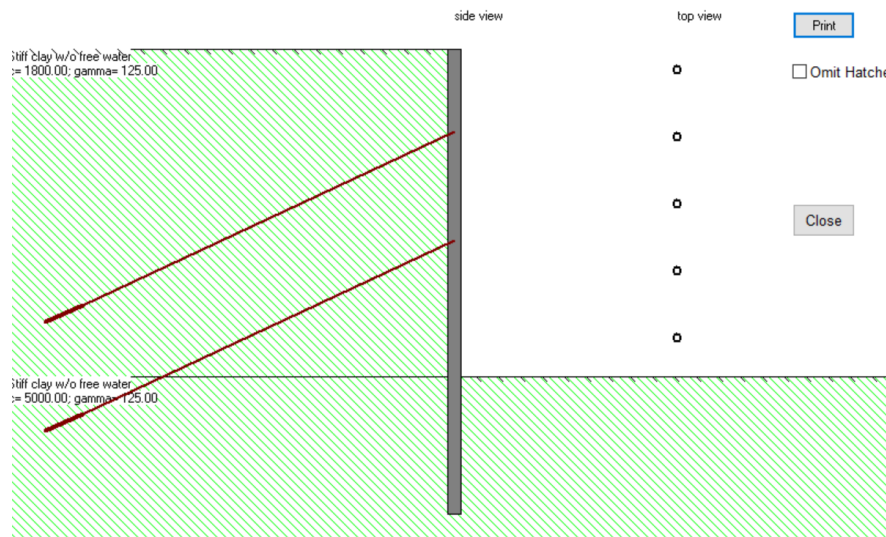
Model of a retaining wall supported by two tie-backs in PYWall 2025
